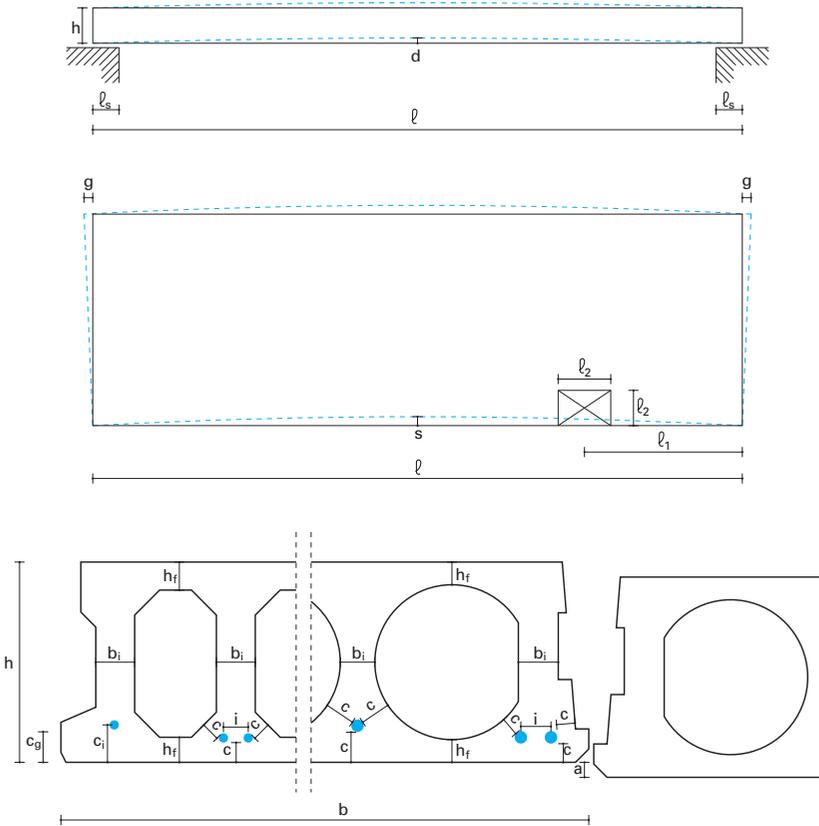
Geometric references for dimensional and assembly tolerances
